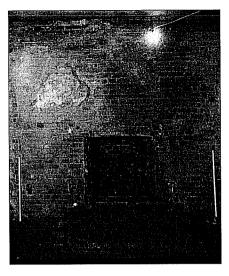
Changing room (B41) showing raised floor and fireplace in south wall (Archive - Photo 55)
